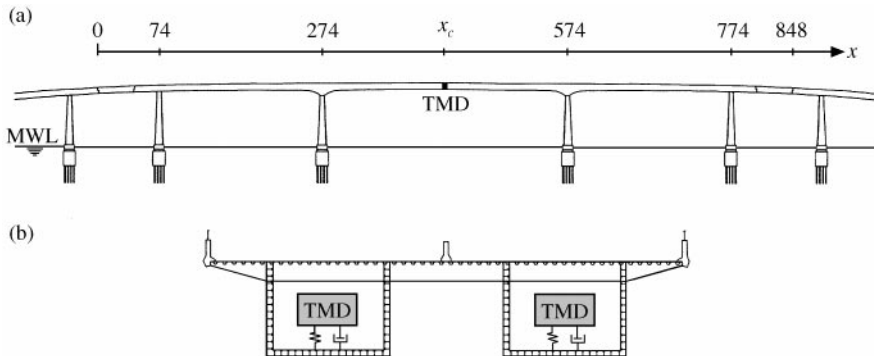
Centre spans of Rio-Niterói bridge. (a) position of tuned mass damper system, (b) tuned mass damper units in the twin steel box girders.
